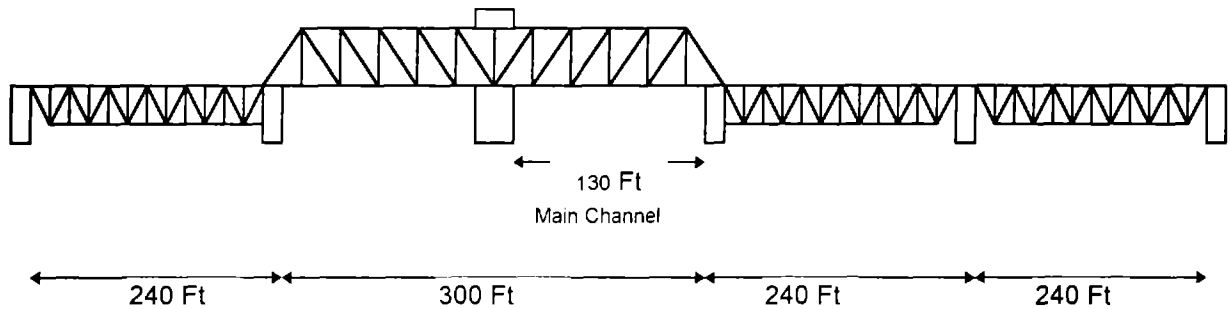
Bridge 5.07 Multi-span Truss Bridge
